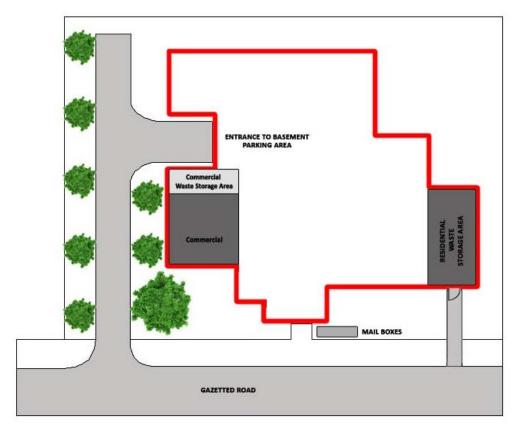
Example of an acceptable kerbside (on-street) Waste Storage Area
